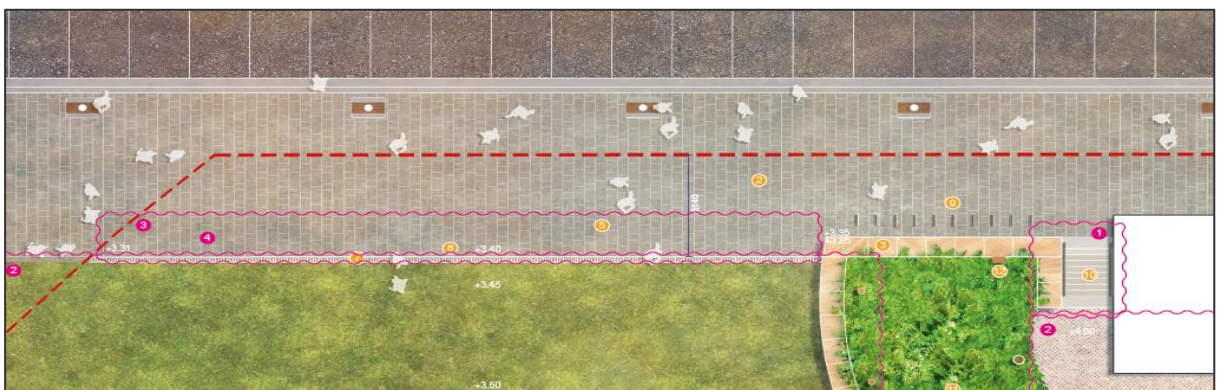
| Deletion of precast concrete seats/bollards on eastern edge of Hickson Park (Source: Applicant)
